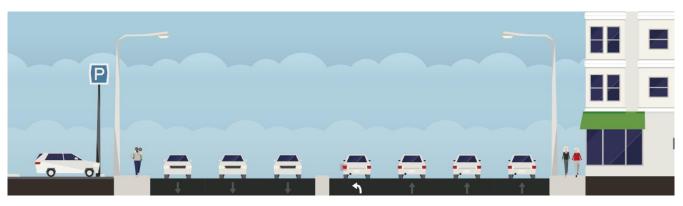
109 Street Facing North (South of 104 Avenue)
